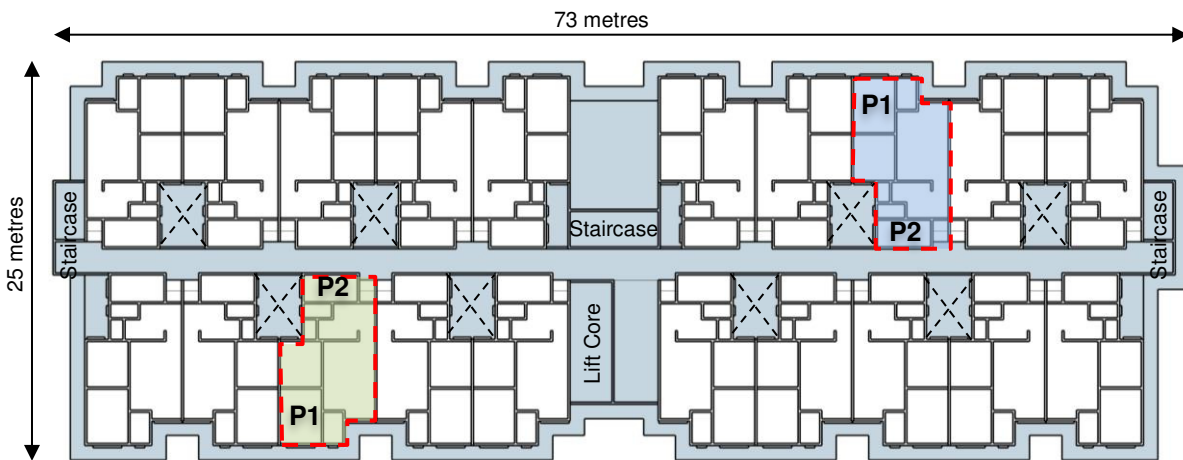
Typical Floor Plan of PPR Seri Aman (Second Generation)
